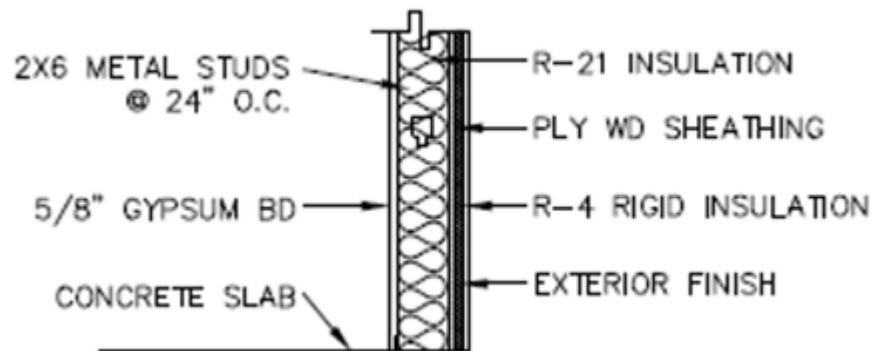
1 Hour Fire-Rated R-21 Wood Framed Wall
